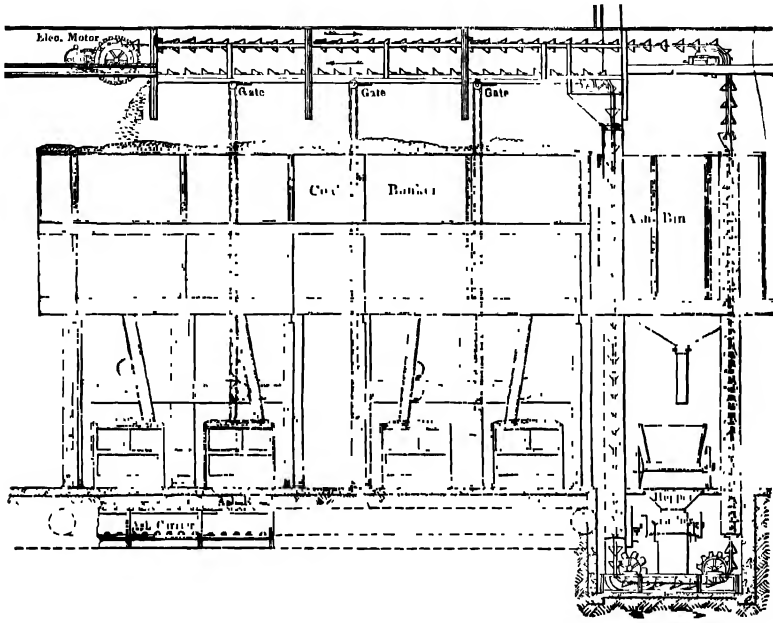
Typical V-Bucket Installation for Handling Coal and Ashes
